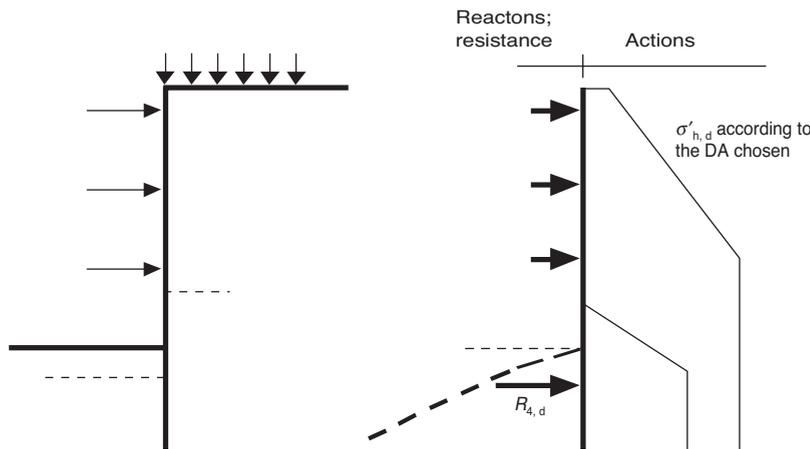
Beam model of a multi-supported wall with assumed earth pressure loads
